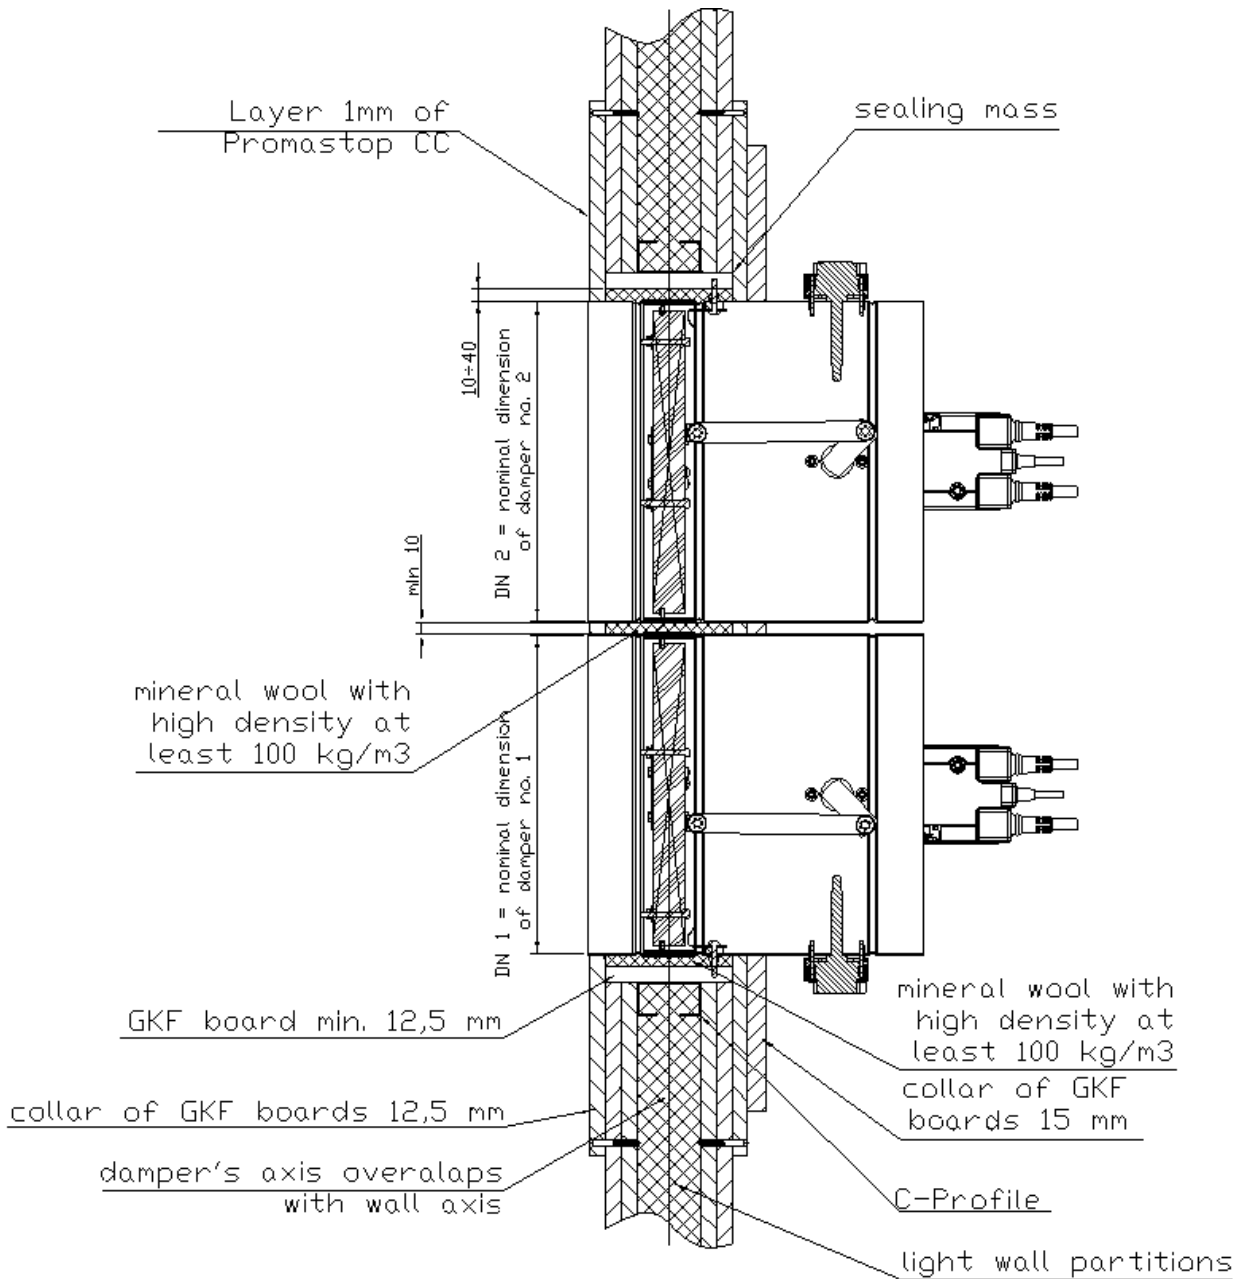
Installation method of KTM-O with minimum distances from adjacent fire dampers.
